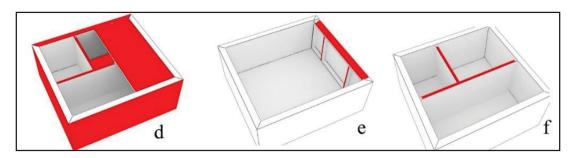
Space plan: d) walls, ceilings, floors, e) prefabricated wall panels, c) rooms
